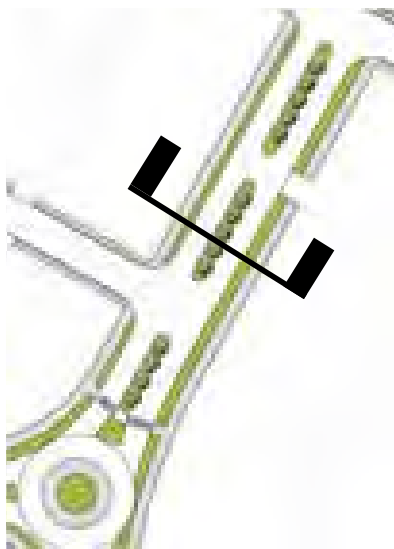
STANDARD COLLECTOR ROAD SECTION (22.0M)
